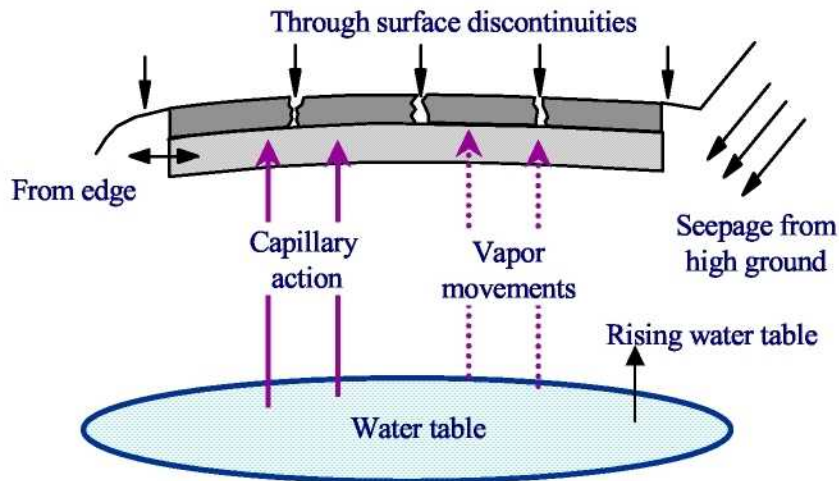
Sources of moisture in pavement systems (NHI 13126).
